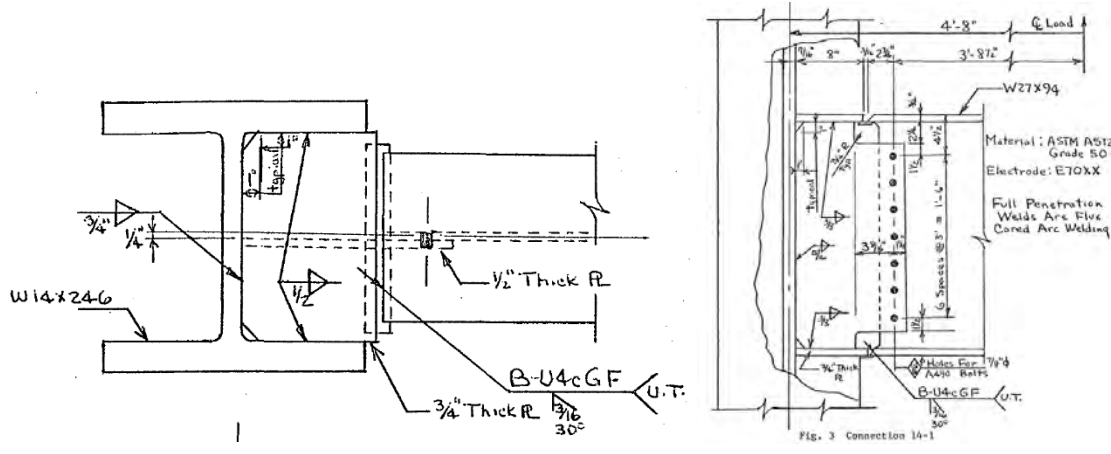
Flange-welded web-bolted connection of specimen MRC-RenA572-W-14-1 (Rentschler et al. 1978)
